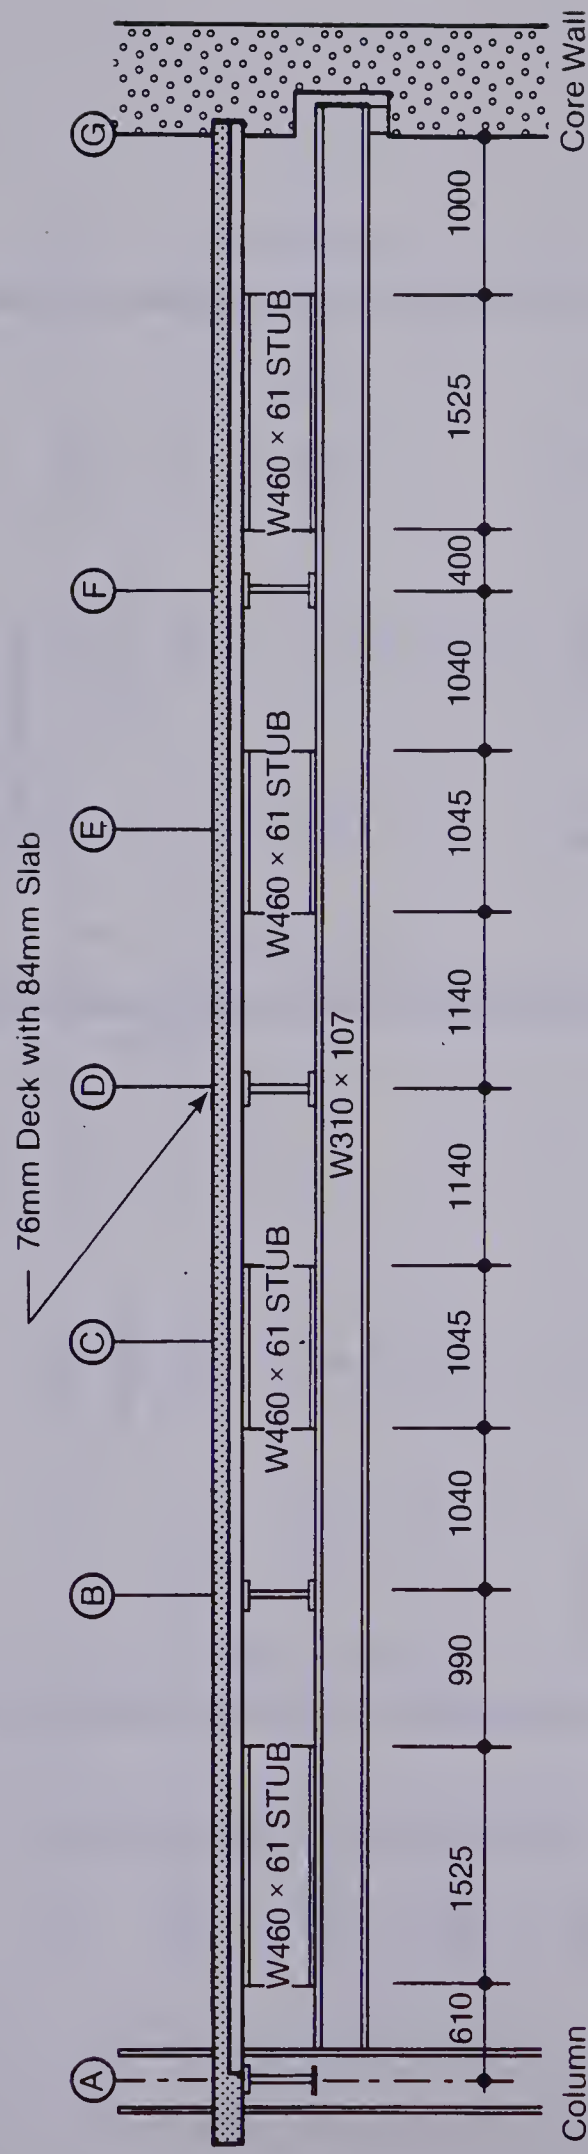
Typical Cross-section of Floor at Stub Girder Position
